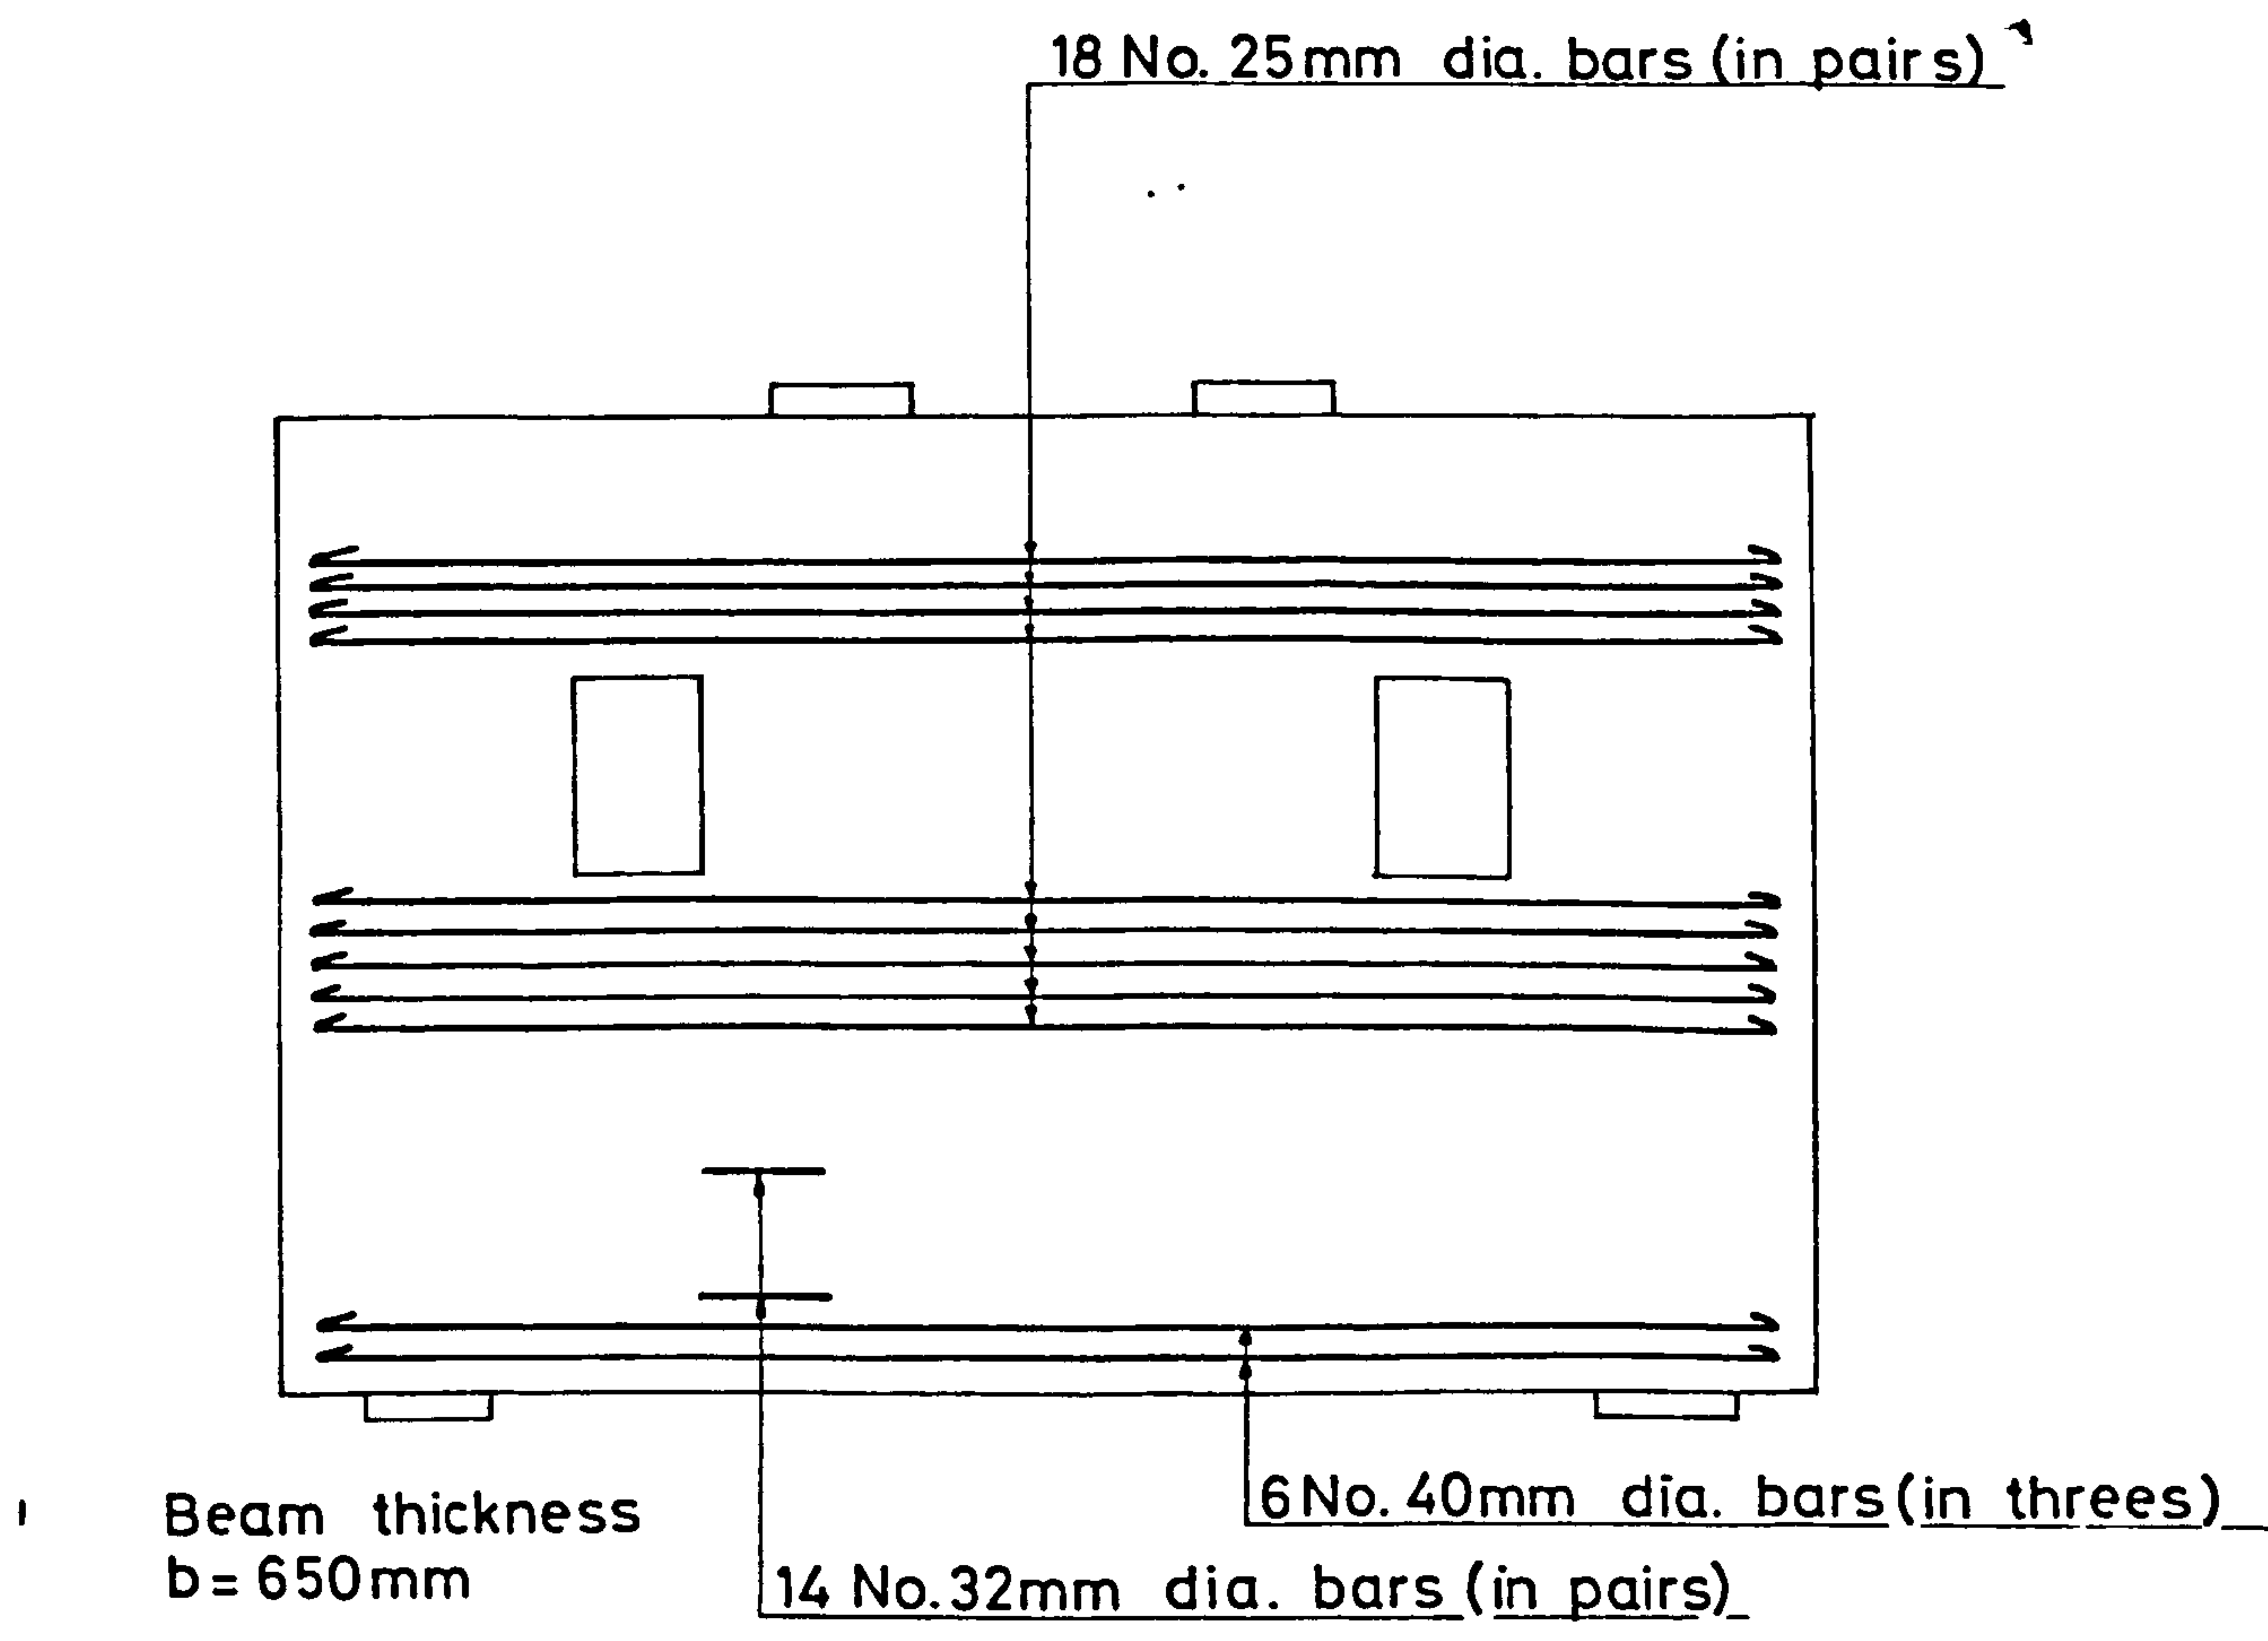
DESIGN EXAMPLE: MAIN STEEL AND WEB STEEL DETAILS
